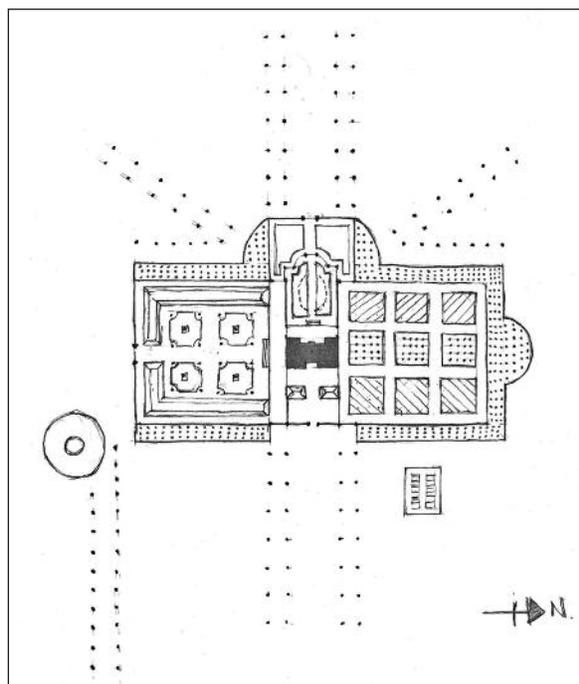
Reconstruction of the garden plan of Newby Hall. *Pete Smith.
